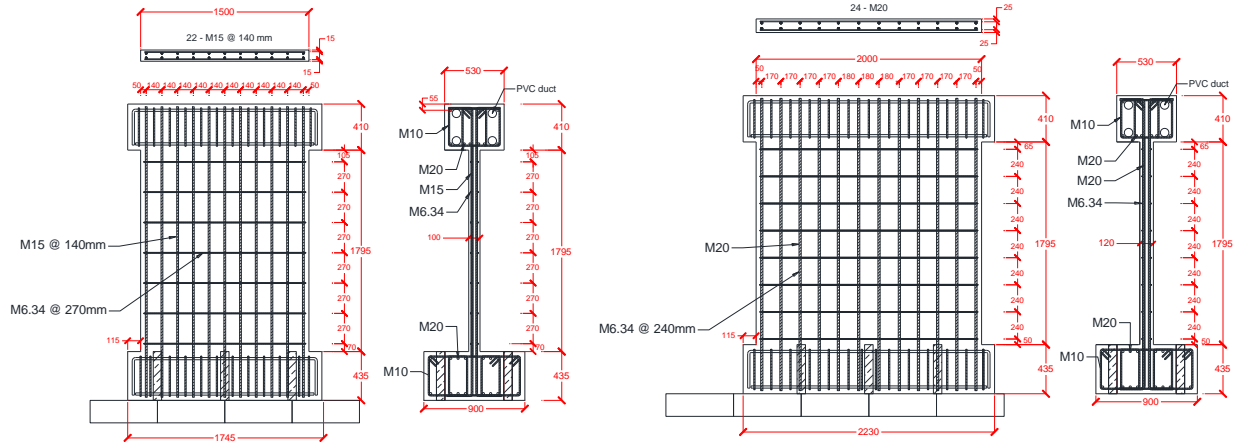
(a) The slender shear wall design on the left; and (b) The intermediate shear wall design on the right
